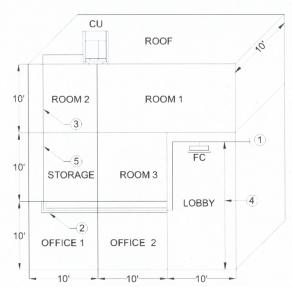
below shows the above exceptions exercised for a multi-story building where the condensing unit is located on the roof with fan-coil units on lower floors.
